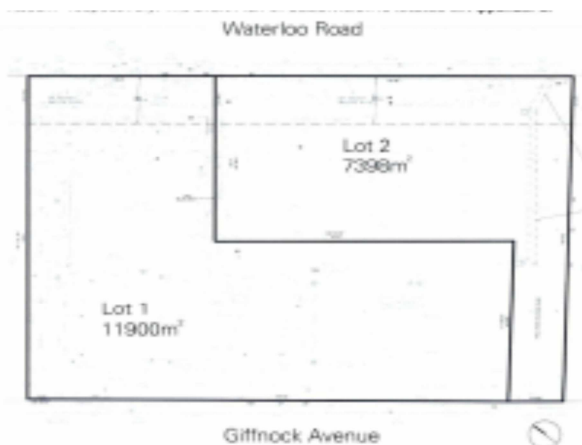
Approved LDA 2011/0443 - subdivision dividing the site into two allotments
